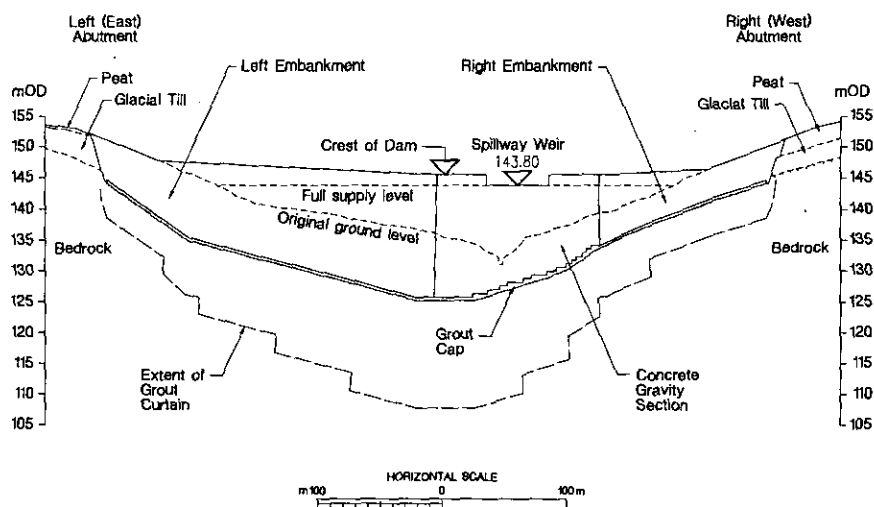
Foundation excavation and grouting at Fullerton Pollan Dam
